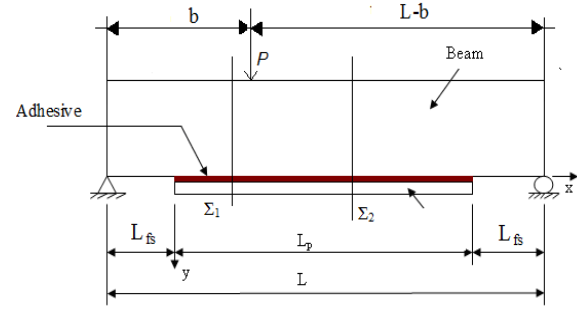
Simply supported beam bonded with a soffit plate under a point load
